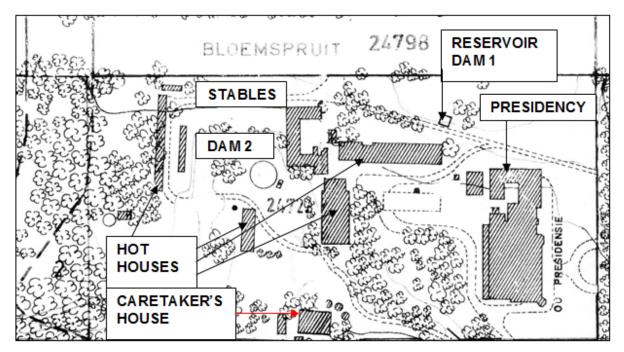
Site plan drawing dating from 1971 (Bloemfontein Town Planning Department). Postcripts by Cobus Dreyer.
